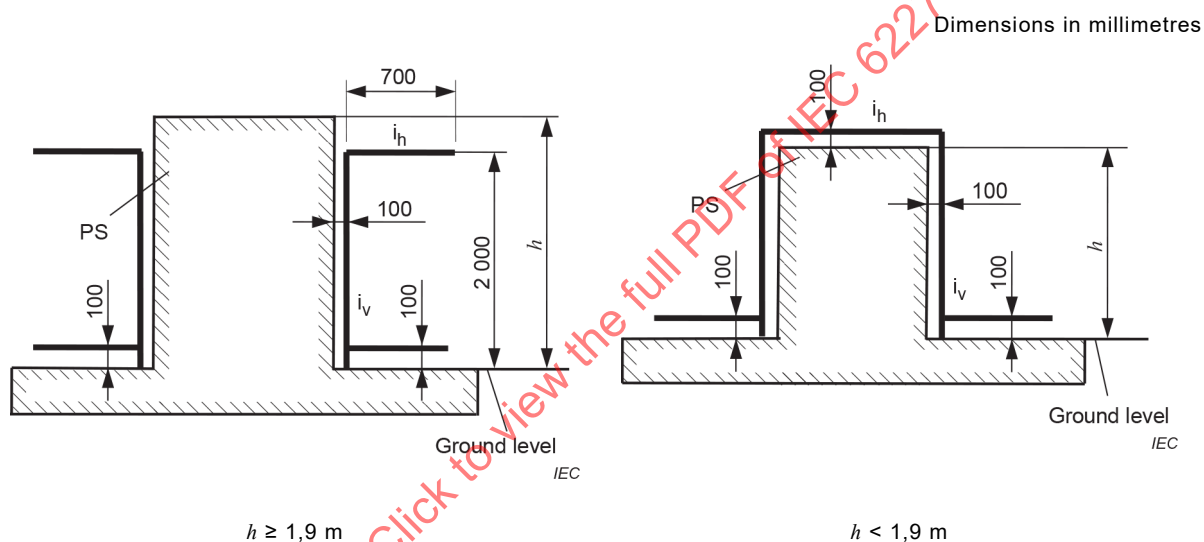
f – Protection of general public around a prefabricated substation (closed doors) having an external pressure relief volume below the ground
